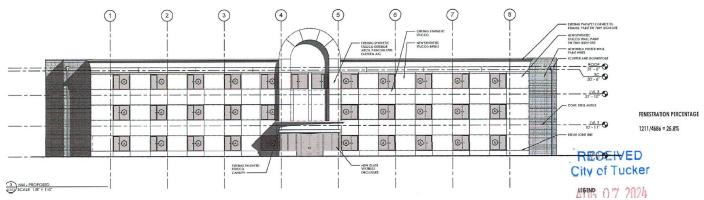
Proposed front elevation facing internal drive aisle. Stucco siding.
